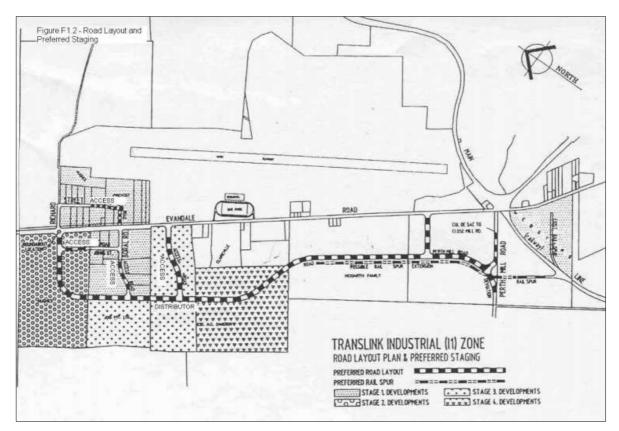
Road layout plan as required by clause NOR-S1.8.1
